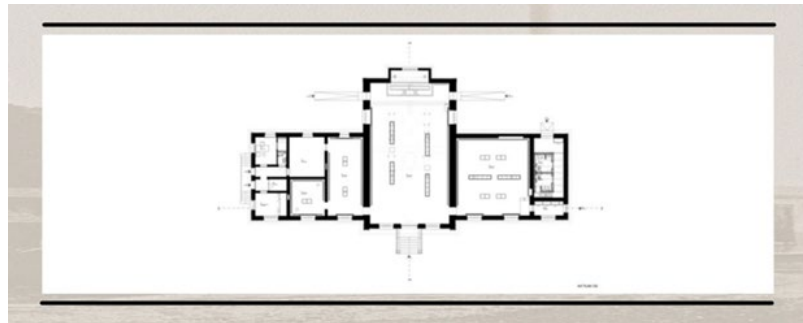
Ground floor plan of the Cendere Art Museum (Çınar, 2022)
